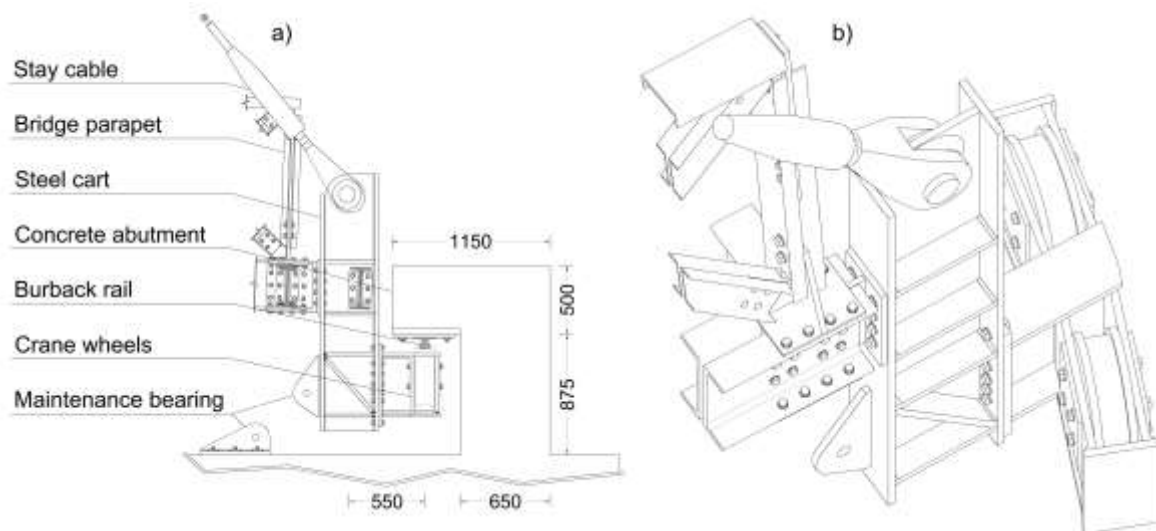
Cart with crane wheels and Burback rail: (a) lateral view; (b) 3D view.
